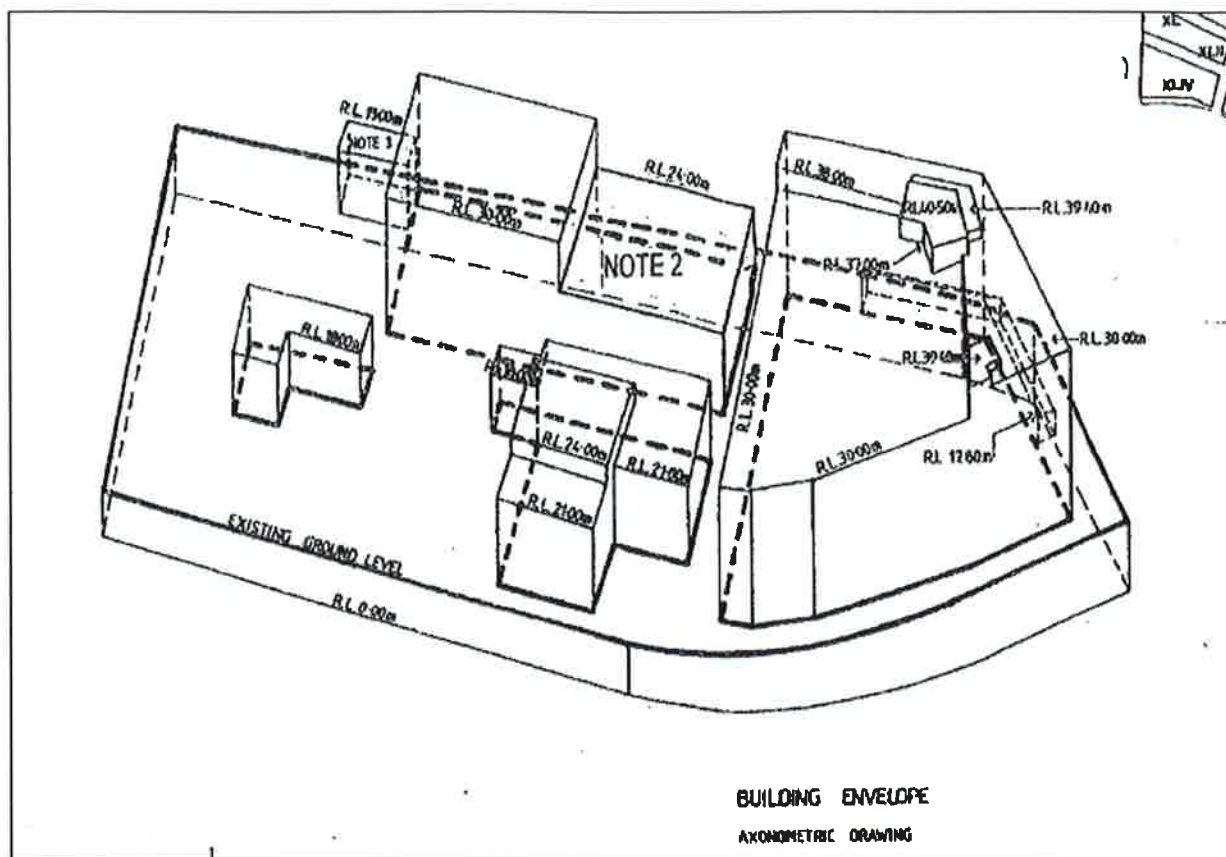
Existing SCRA Scheme Drawing (Source: Applicant's EIS)
